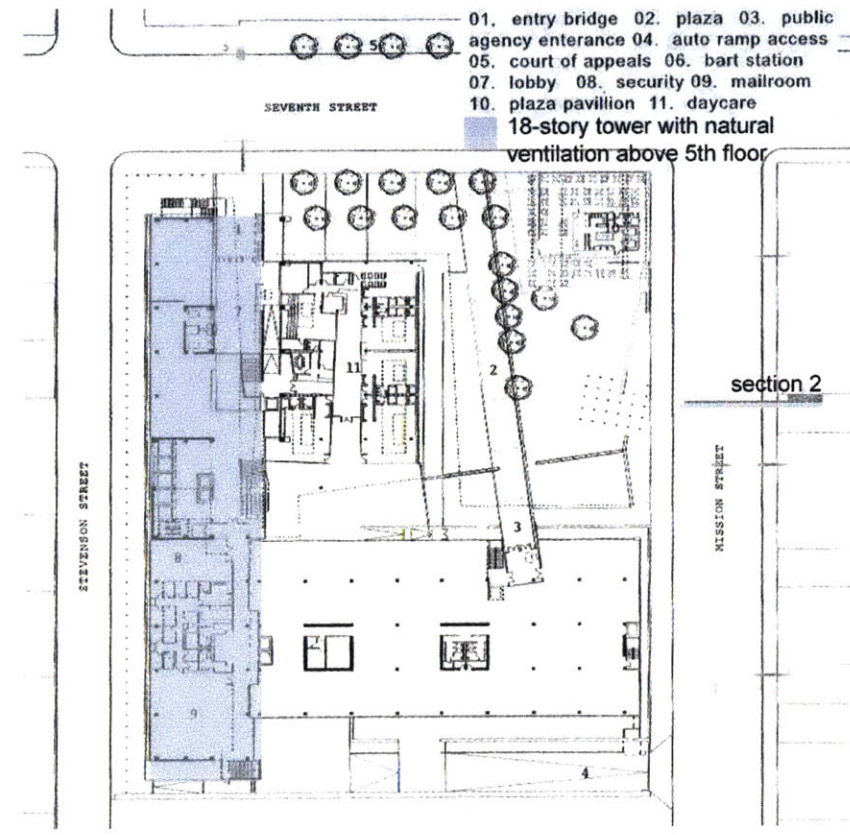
SFFB plan highlights naturally ventilated tower (modified from GA document 2002)
